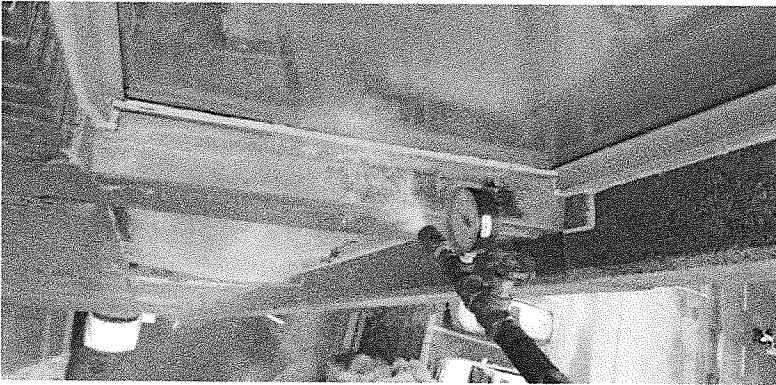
Testing with spray nozzle at window, west facade, eleventh floor
